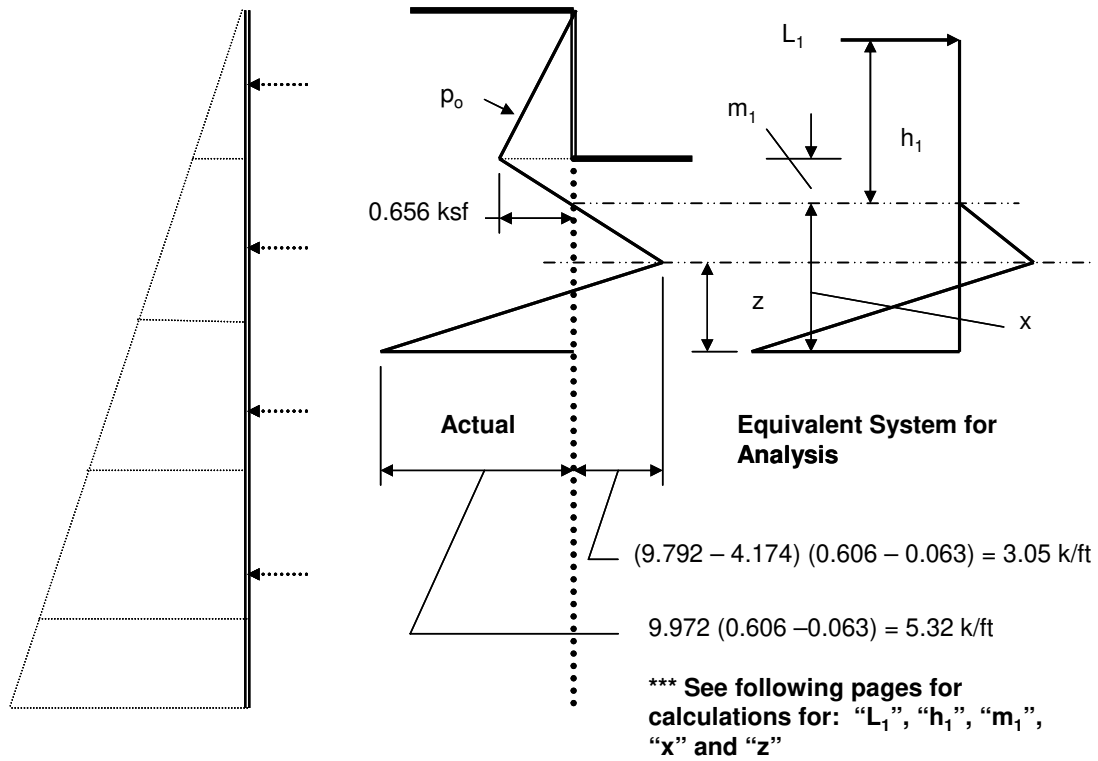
Excavate to elevation 78.5 - first stage excavation
